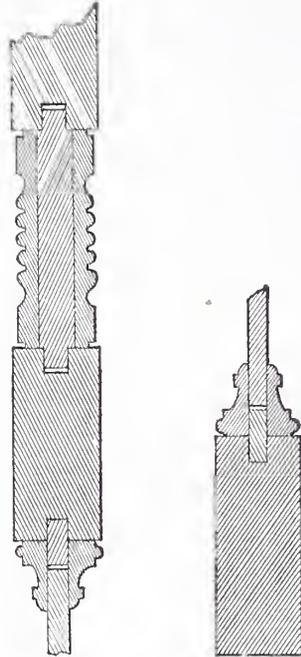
and 15.—Detail of Middle Rail and Stiles of Door.—Scale, 3 Inches to the Foot.
